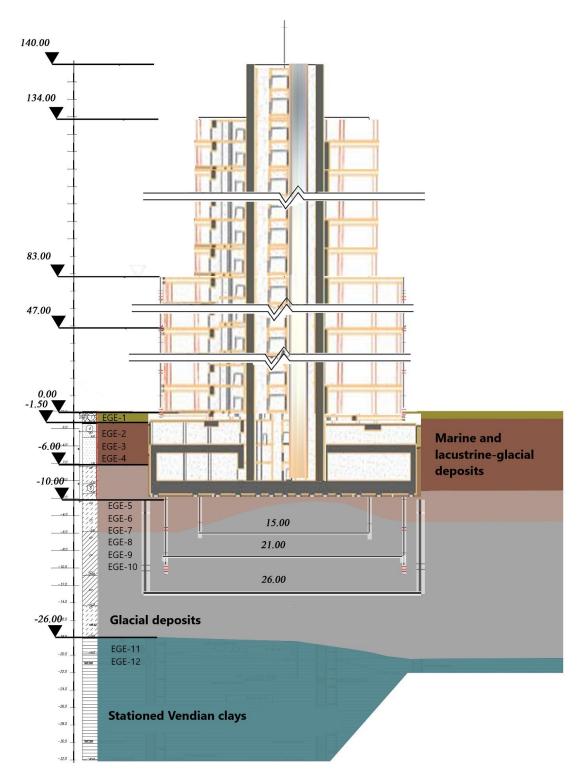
Scheme of the plan-height reference of the building at the construction site, section along the axis 3-3, section I-I.
